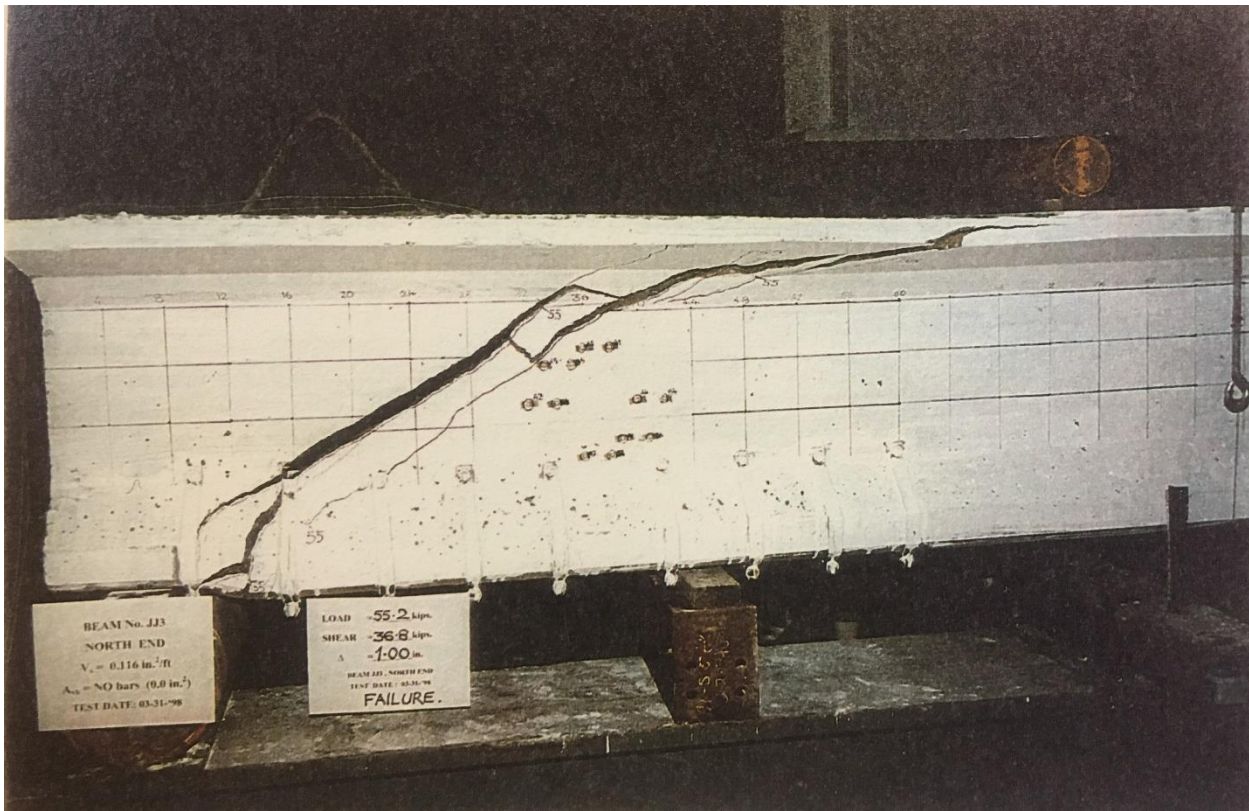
JJ3 North Beam End After Testing from Jacob (1998)
